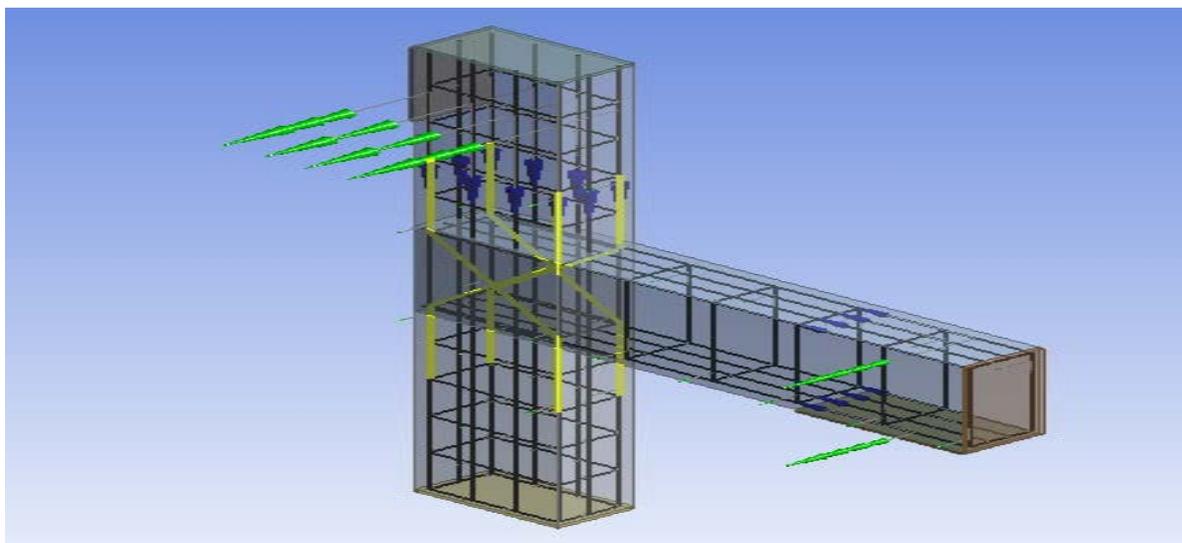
Modified reinforcement detailing of exterior joint with one beam (SS1)
